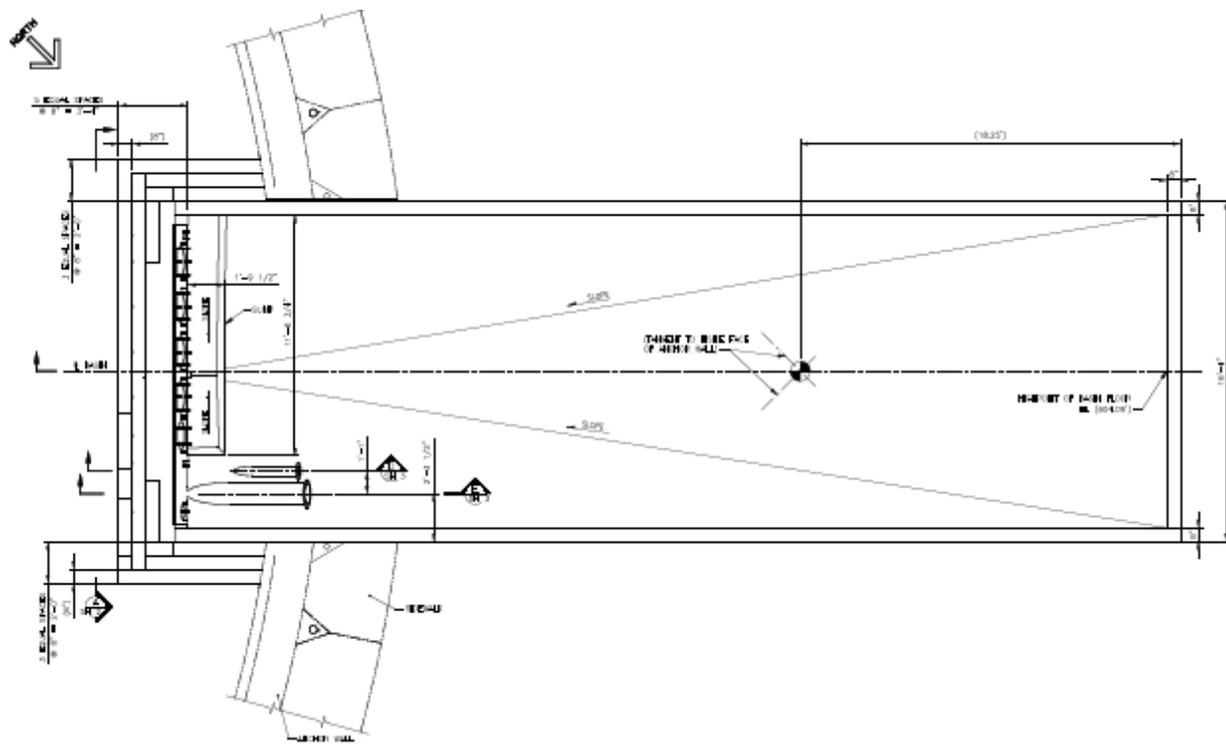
LERF Basin 41 Catch Basin Plan View (H-2-838751, Sheet 1)
